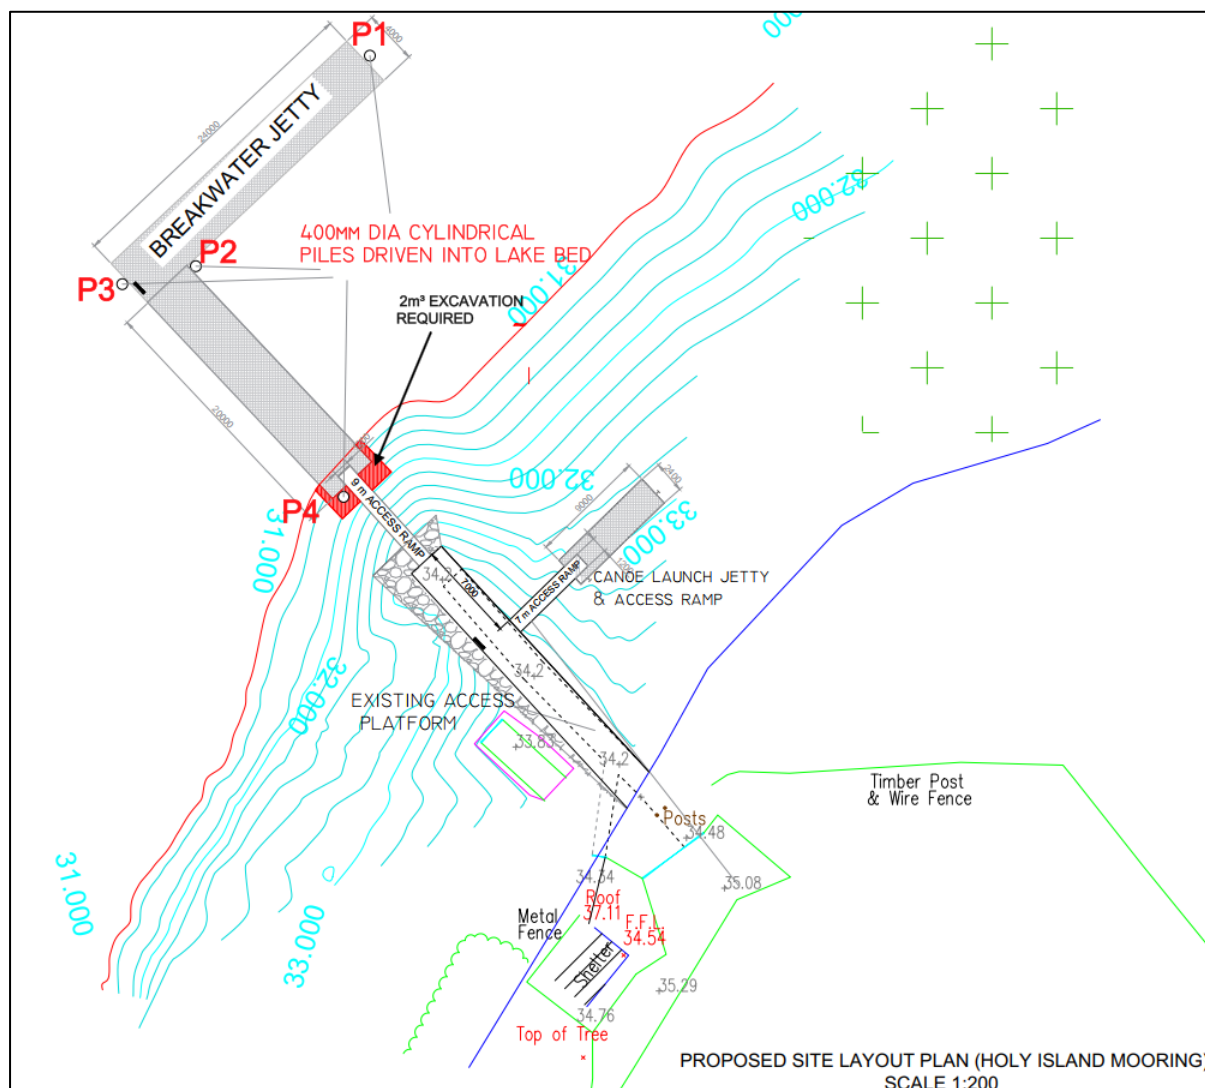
Extract from Waterways Ireland site layout plan (Drawing Number: T01/WSS/P/02) for proposed new jetties and visitor mooring at Inis Cealtra.
